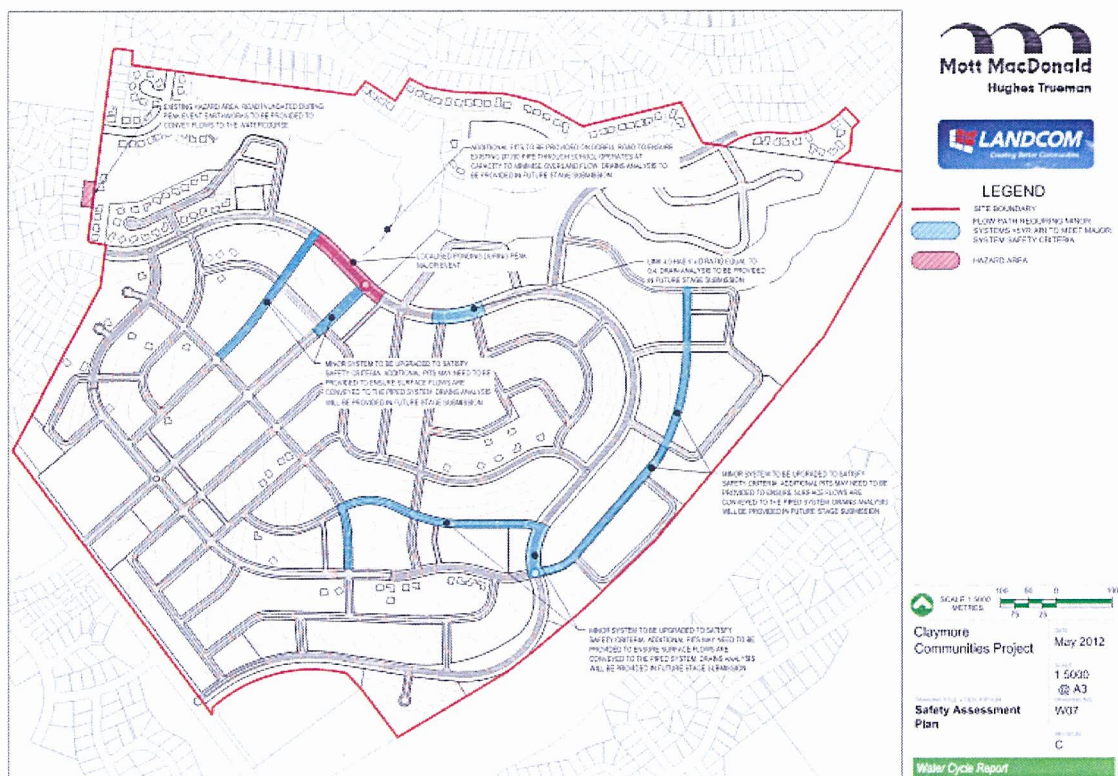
Identified Potential Hazard Areas and Oversized Trunk Stormwater Lines
